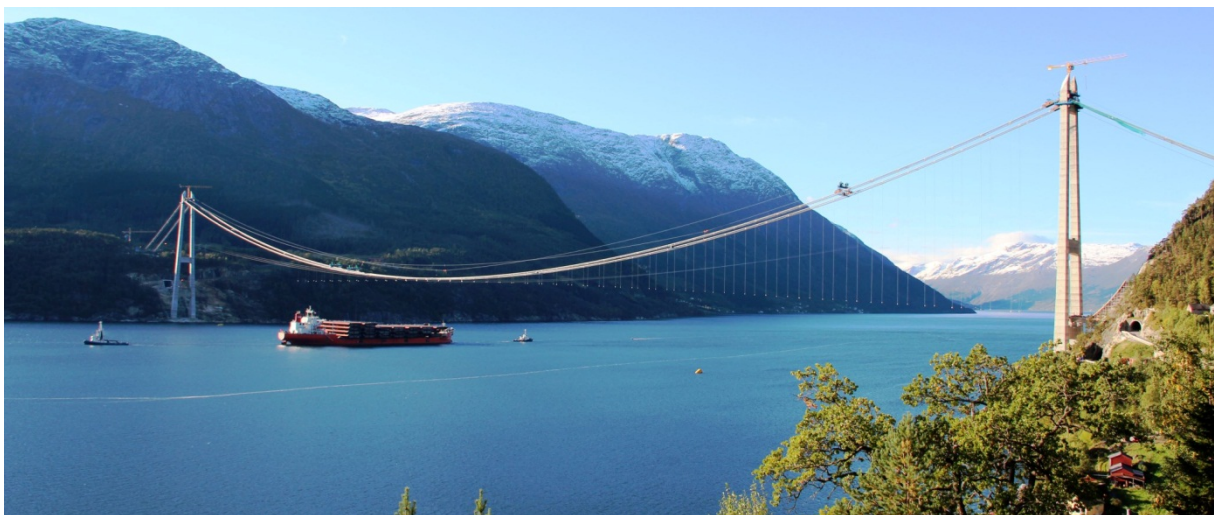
The Hardanger Bridge - Towers complete with main cables and hangers [13]
